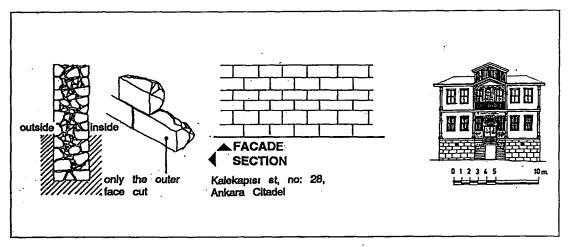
Use of Cutstone Coursing in Ground Floor Masonry Walls
